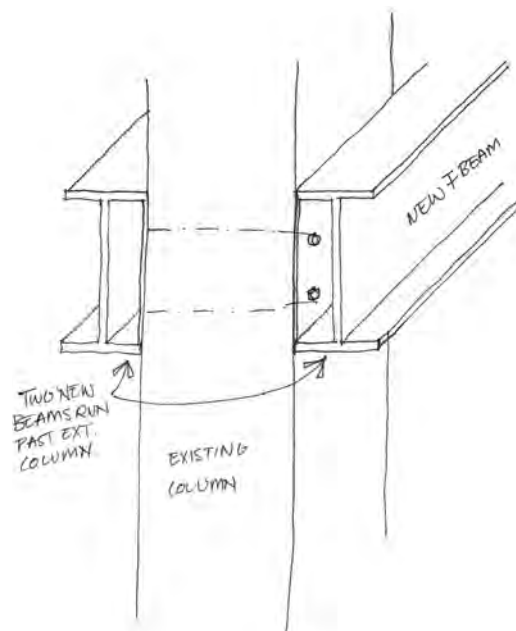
Restore - The new steel touches the existing concrete lightly, a steel spacer separates the two making it seem like they do not even touch
